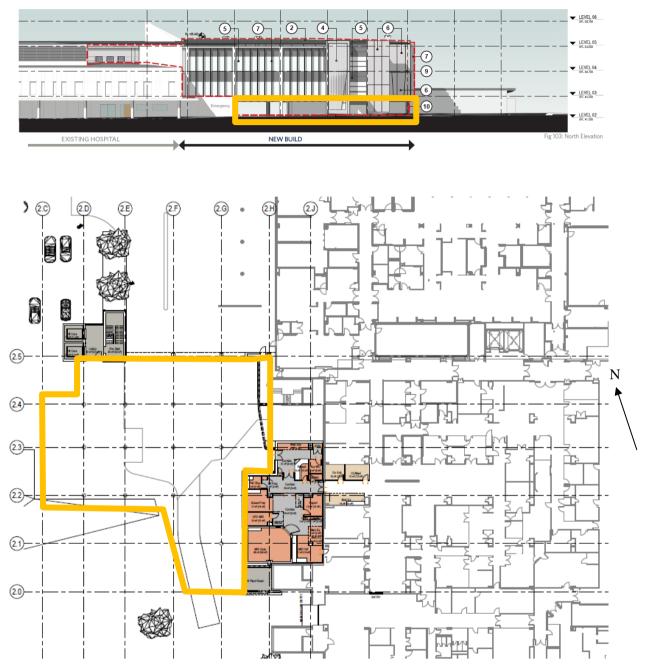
North elevation of upgrade works with under croft area highlighted (Top) Ground floor plan of proposed development with under croft area highlighted (Bottom)
